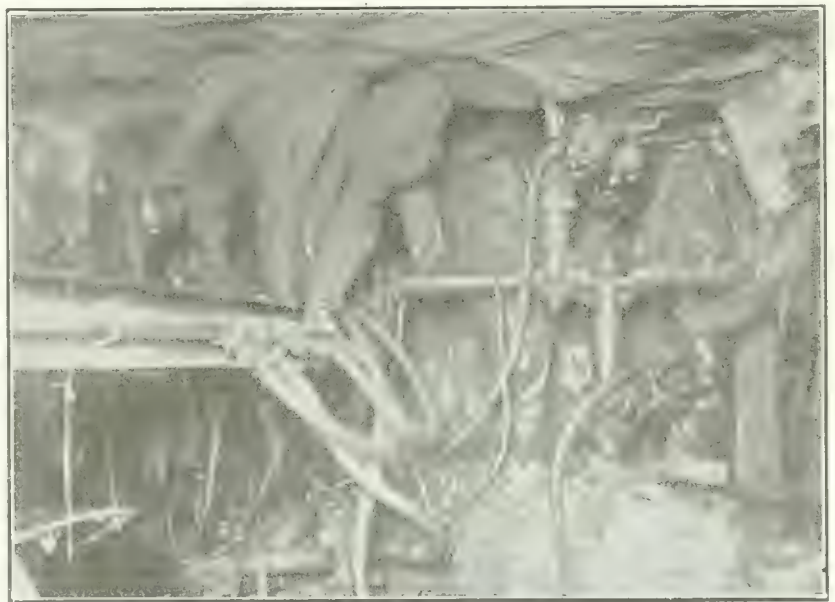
Heading Excavation Using Muck Handling Drill Carriage.
